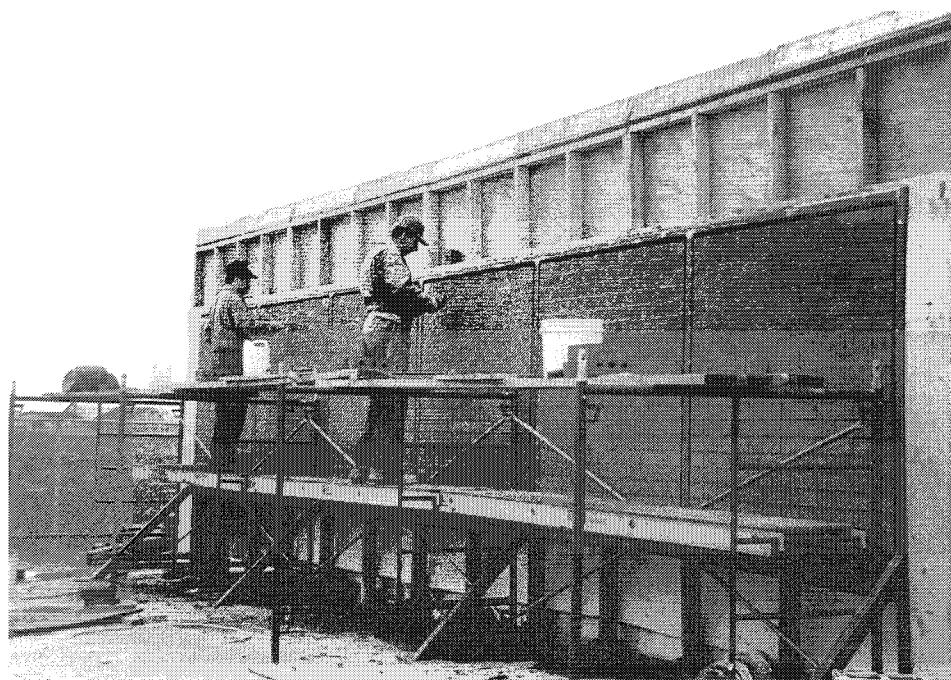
Installation of metal flashing for recuperation of run-off water.
